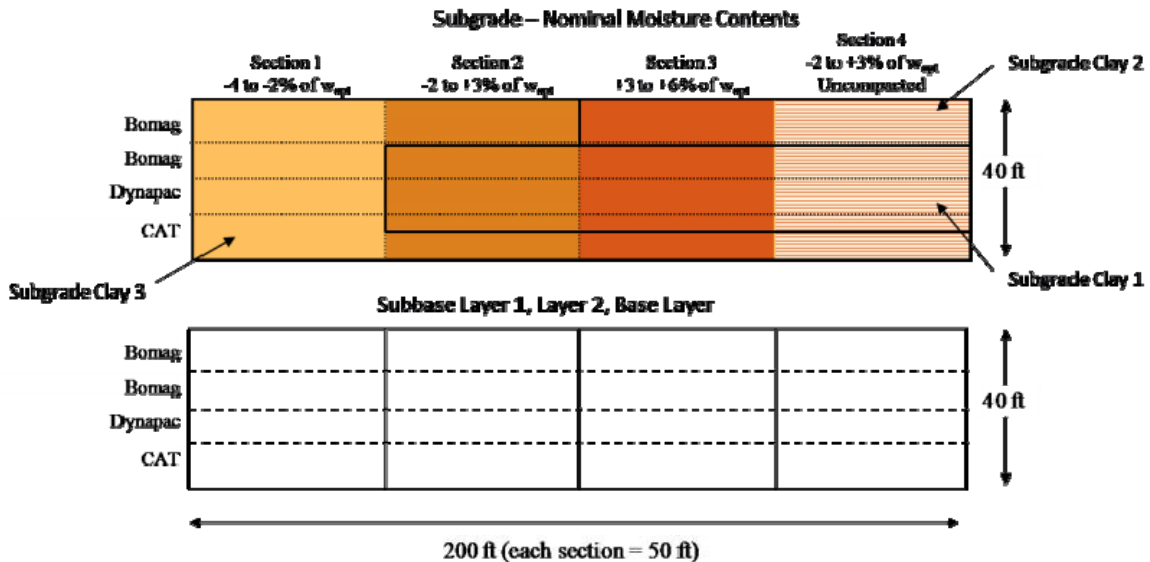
Plan view of test bed construction at the I-25 Colorado project
